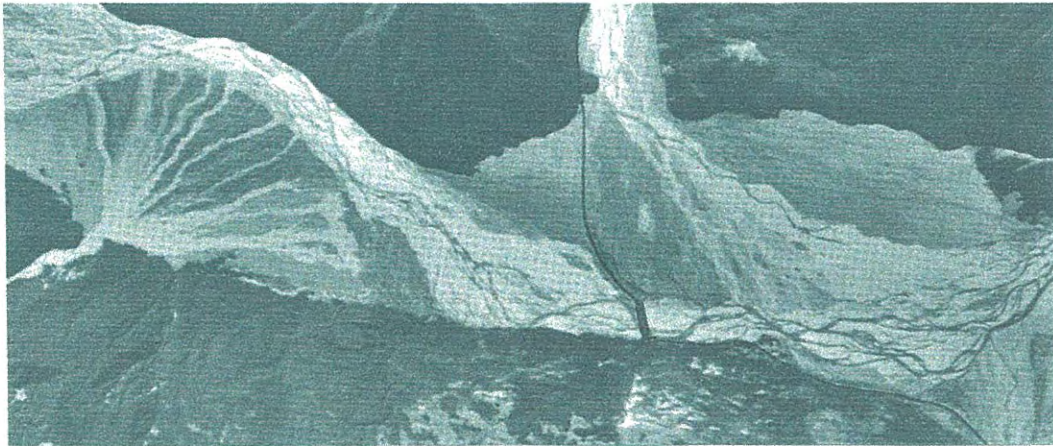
Aerial photo of a bridge with an abutment located on an active alluvial fan (the road and bridge are highlighted); flow is to the right.
